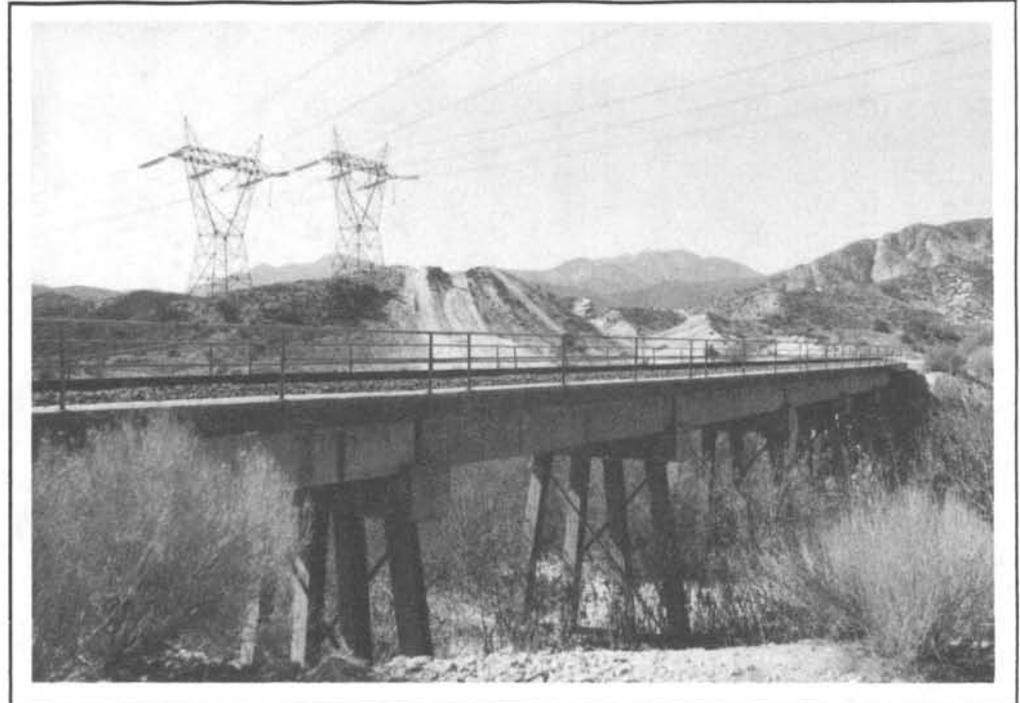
Concrete Beam Railroad Bridge in Cajon Creek Near Cajon Junction
